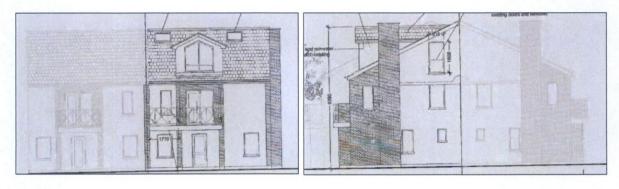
West elevation (I) and south elevation (r) granted under Reg. Ref. SD21B/0273.
